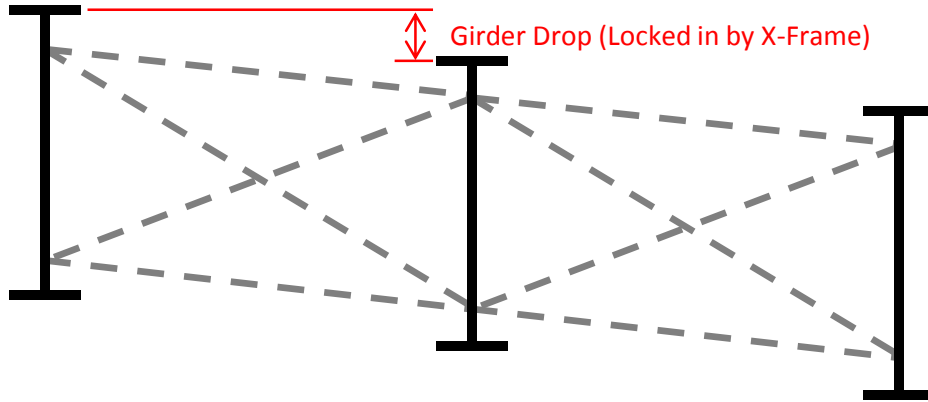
Drop between Girders at an Intermediate Cross-Frame
